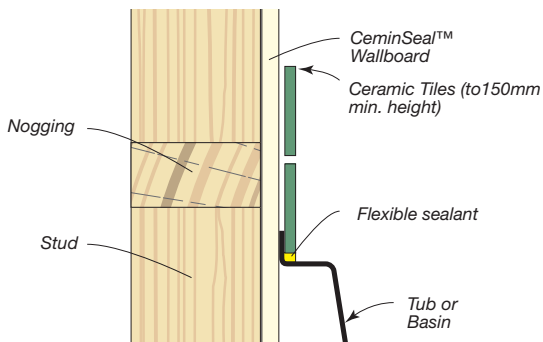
Alternative Tub/Basin Installation (Discontinuous Linings) – Elevation
